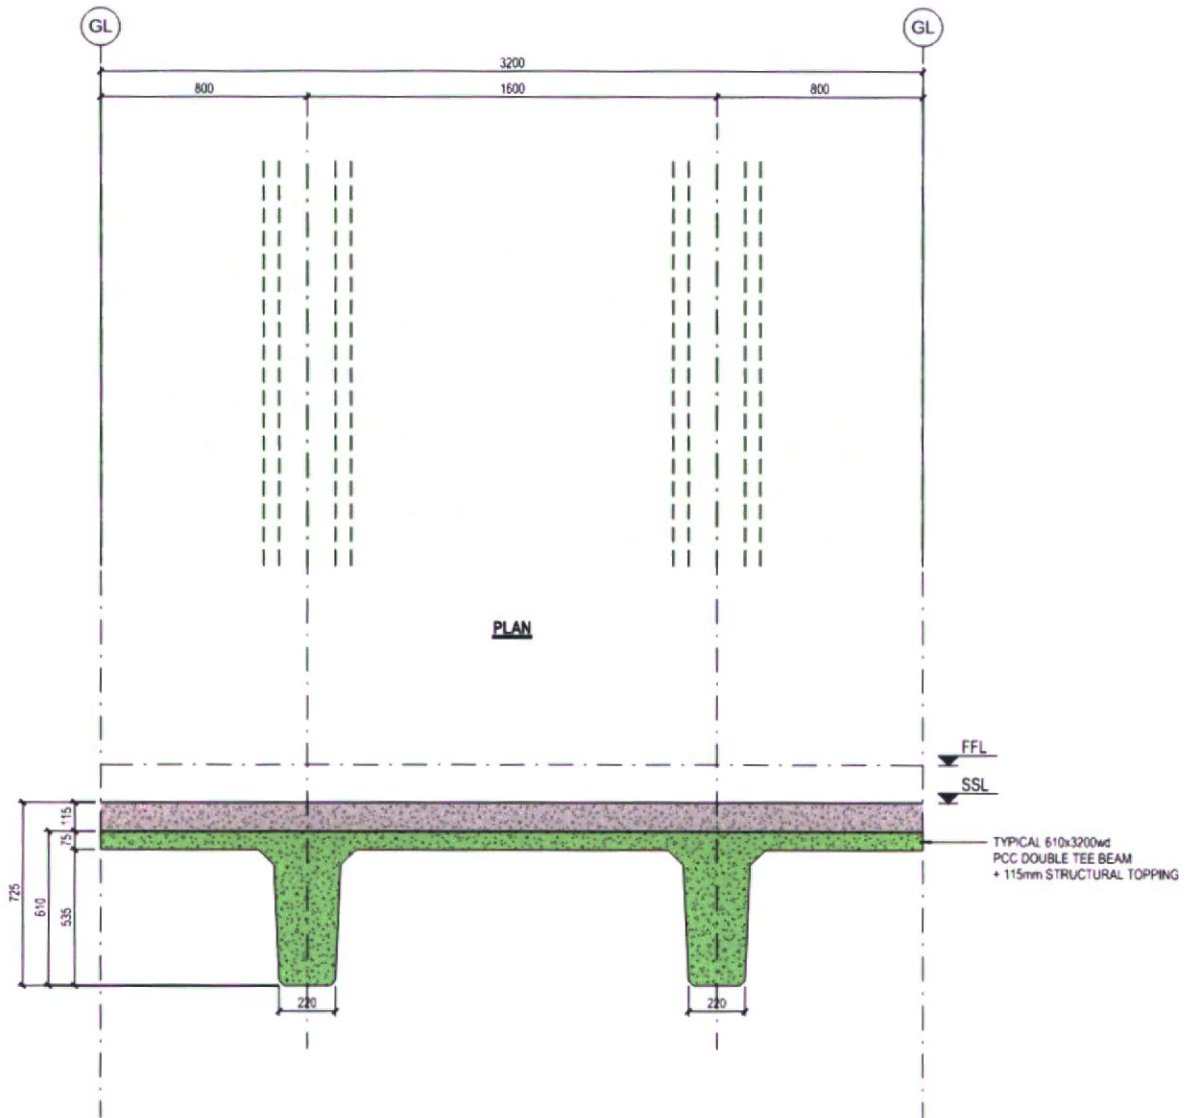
Typical Banagher Pre-cast Concrete Double Tee Beam Profile
